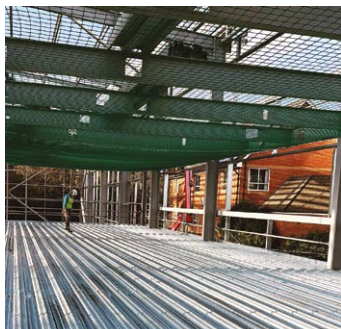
Decking providing a safe working platform and safety 'canopy' to protect workers below from falling objects (Photo courtesy of Composite Profiles UK)
